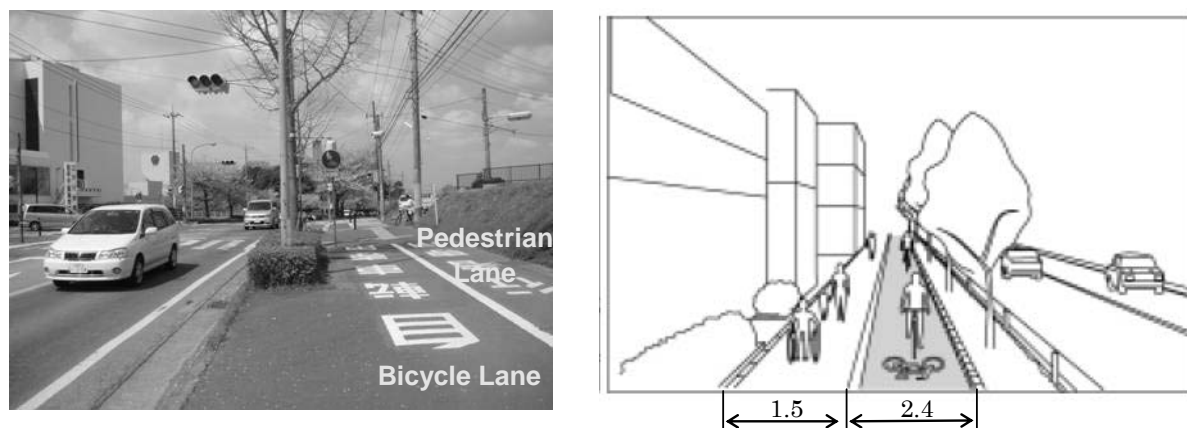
Typical Cross Section (Separated Bikeway on Sidewalk)
